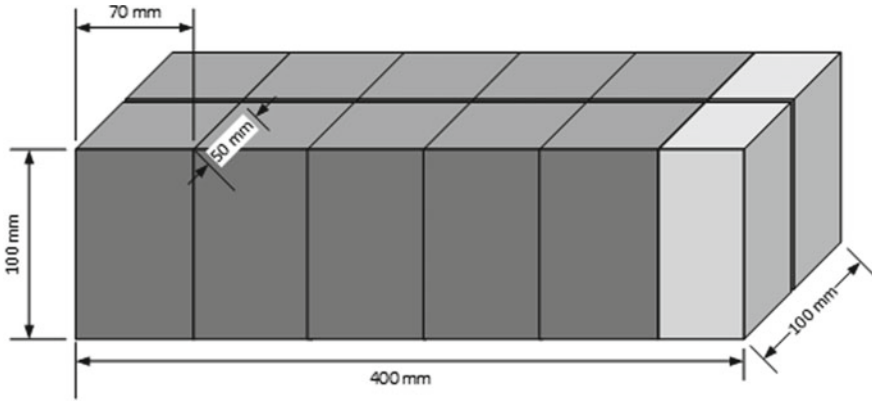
Schematic of the concrete specimens cutting plan, to make 10 specimens from one standard $400 \times 100 \times 100$ mm concrete prism
